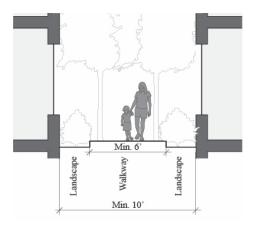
At least 10' wide open space with a minimum of 6'wide walkway.
